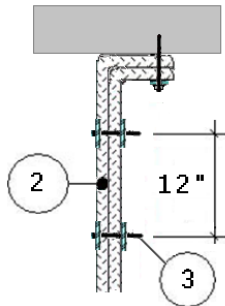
Pin Method for Duct Insulation to Floor/Ceiling or Wall for Three-Sided and Two-Sided Installation for Round Ducts
